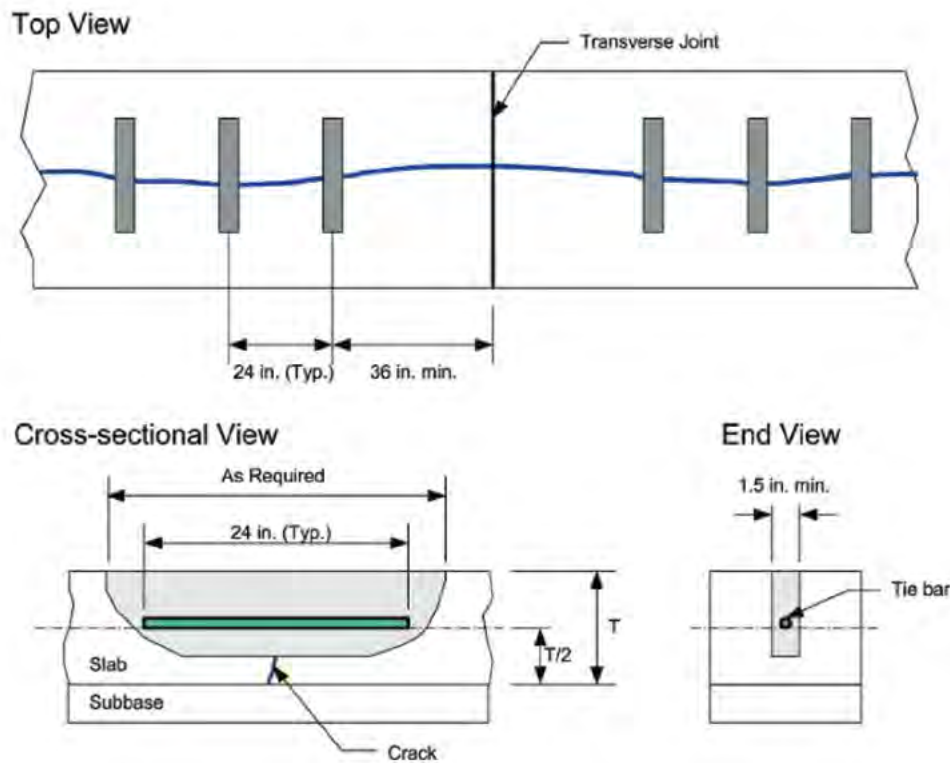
Slot-stitching a longitudinal crack with tie bars to stabilize and provide load transfer.
